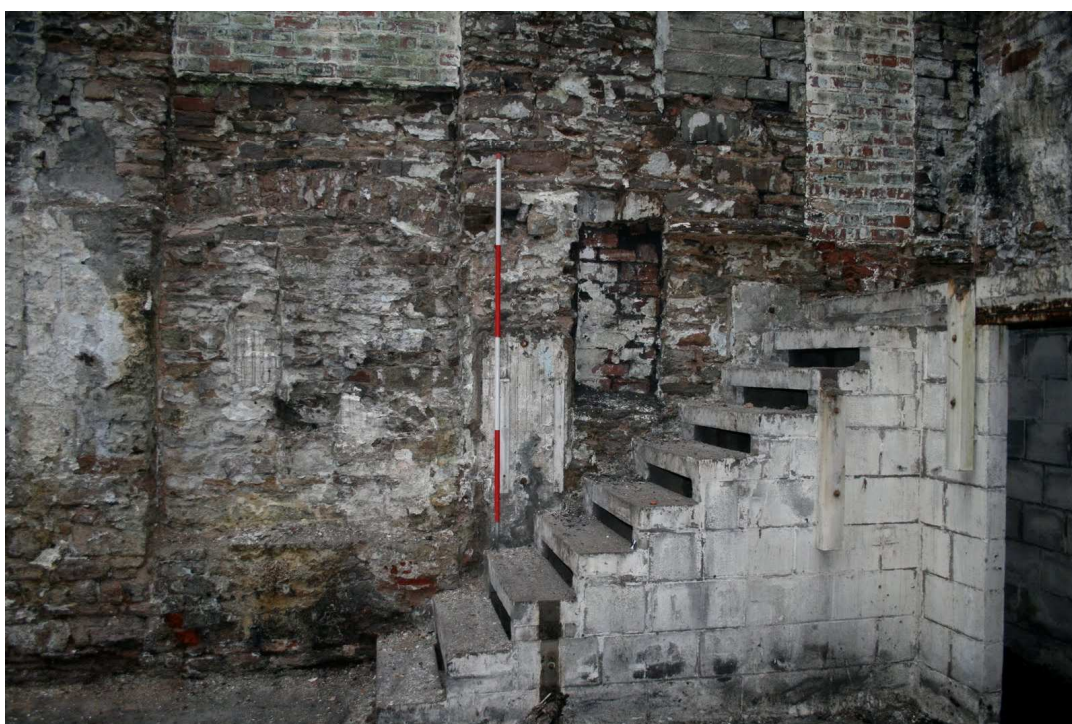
Blocked windows, inserted stair, and possible blocked end bearing bracket, Bay 12
